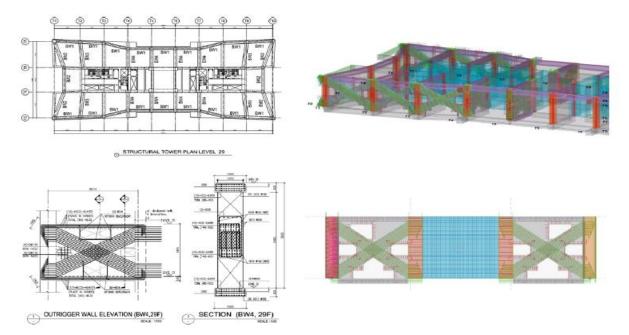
Structural reinforcement detailing with production of 2D detailed drawings (Lee et al., 2012).
